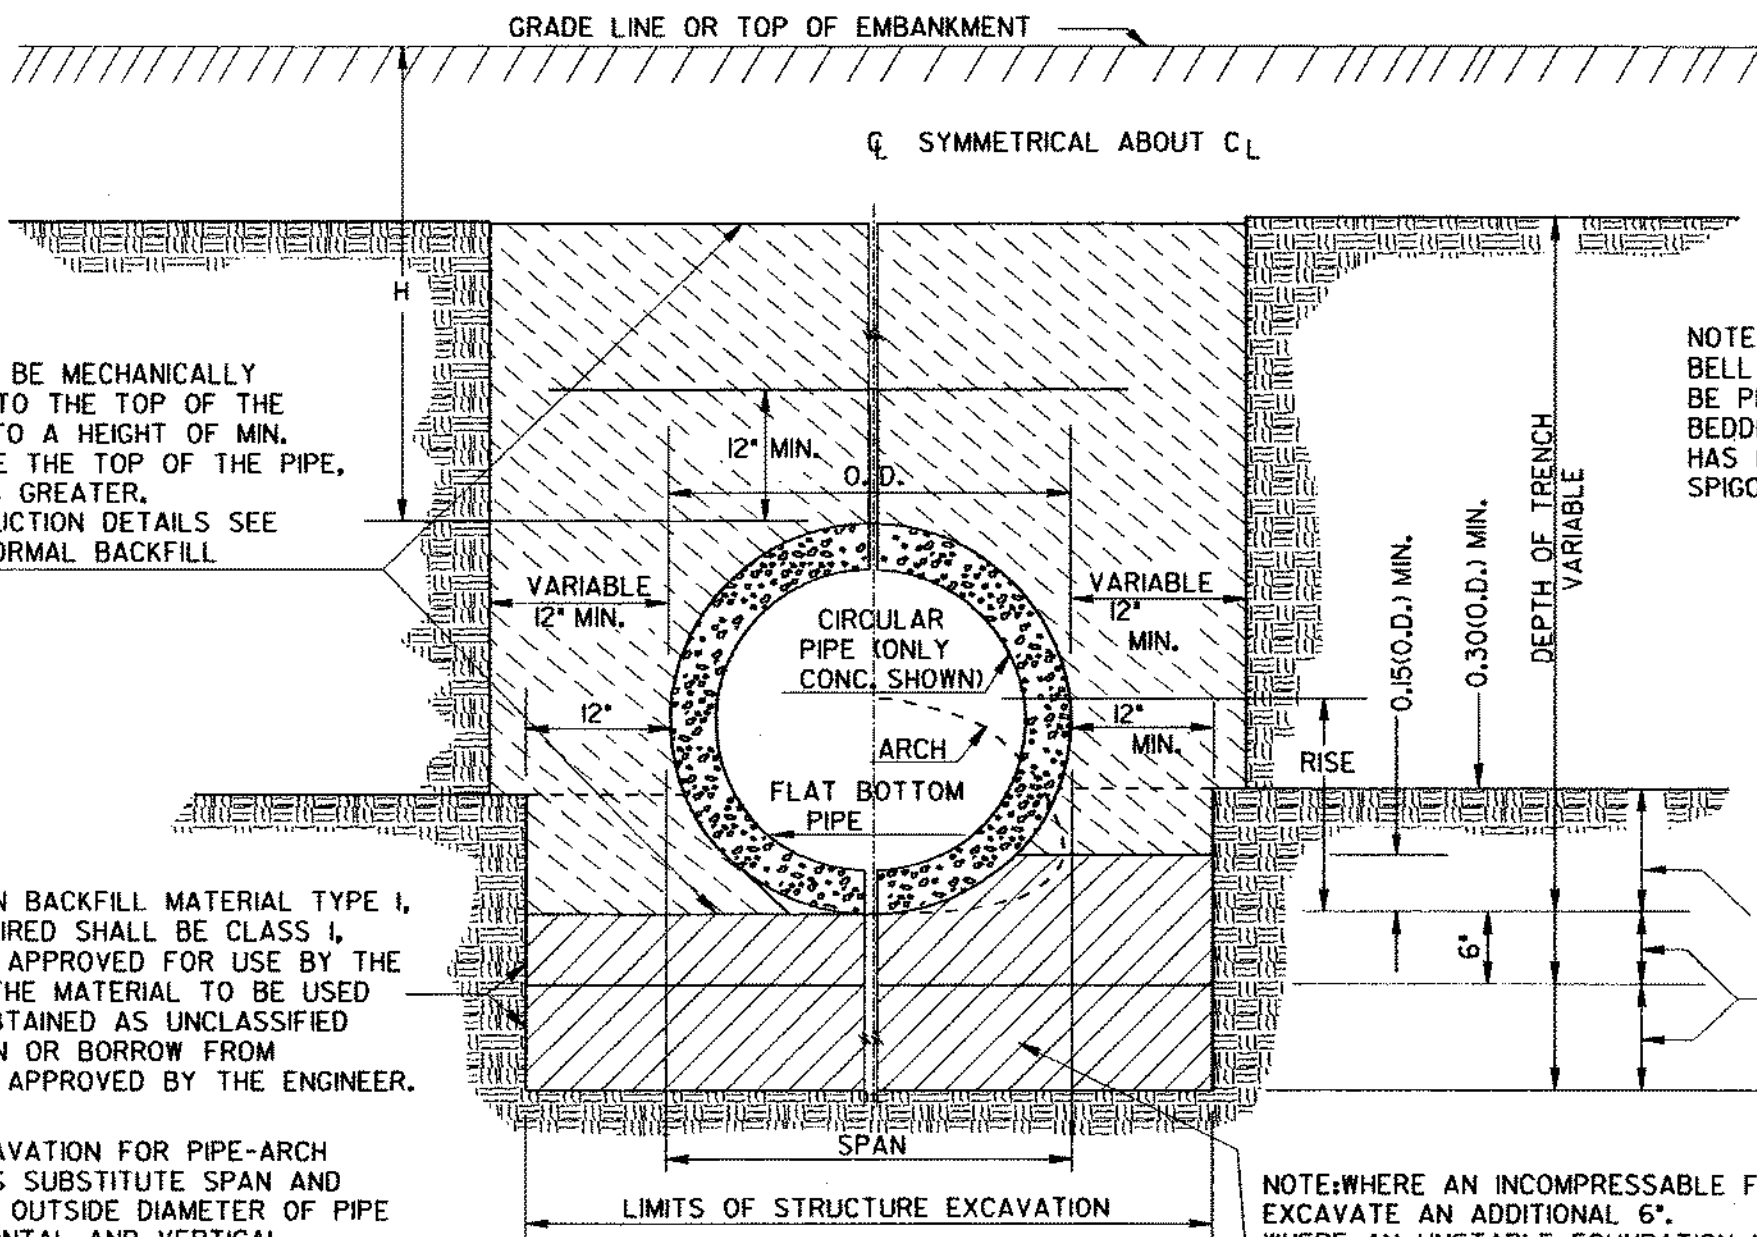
DETAIL SHOWING MINIMUM COVER FOR PIPE CULVERTS
